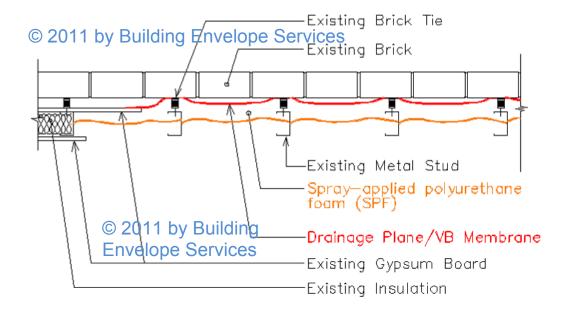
"Inside-out" approach (© 2011 by Building Envelope Services; reprinted with permission)
